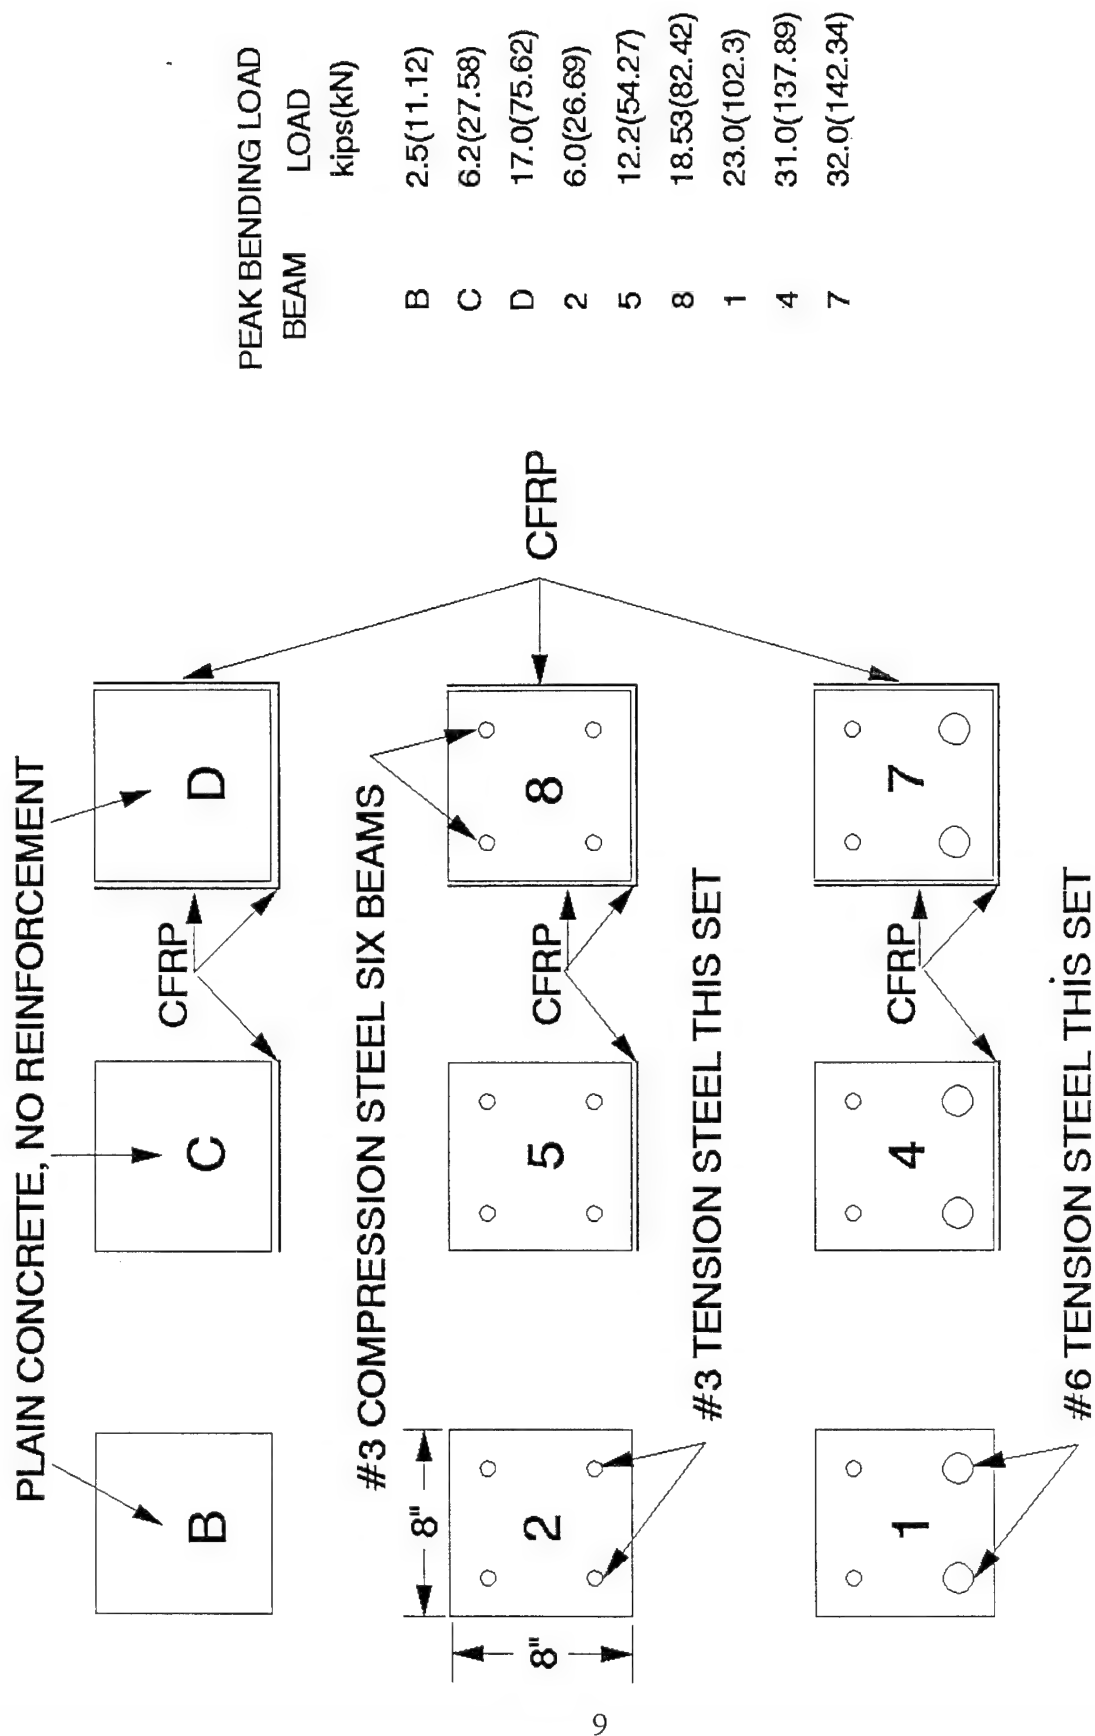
Beam cross section configuration and peak experimental load for 1993 beam tests.
